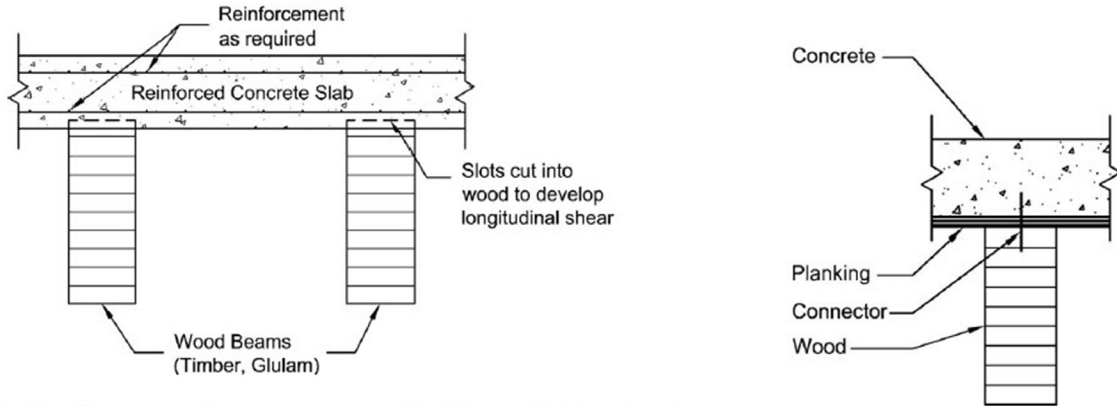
Traditional wood–concrete composite T-beam deck (adapted from Clouston and Schreyer 2006)
